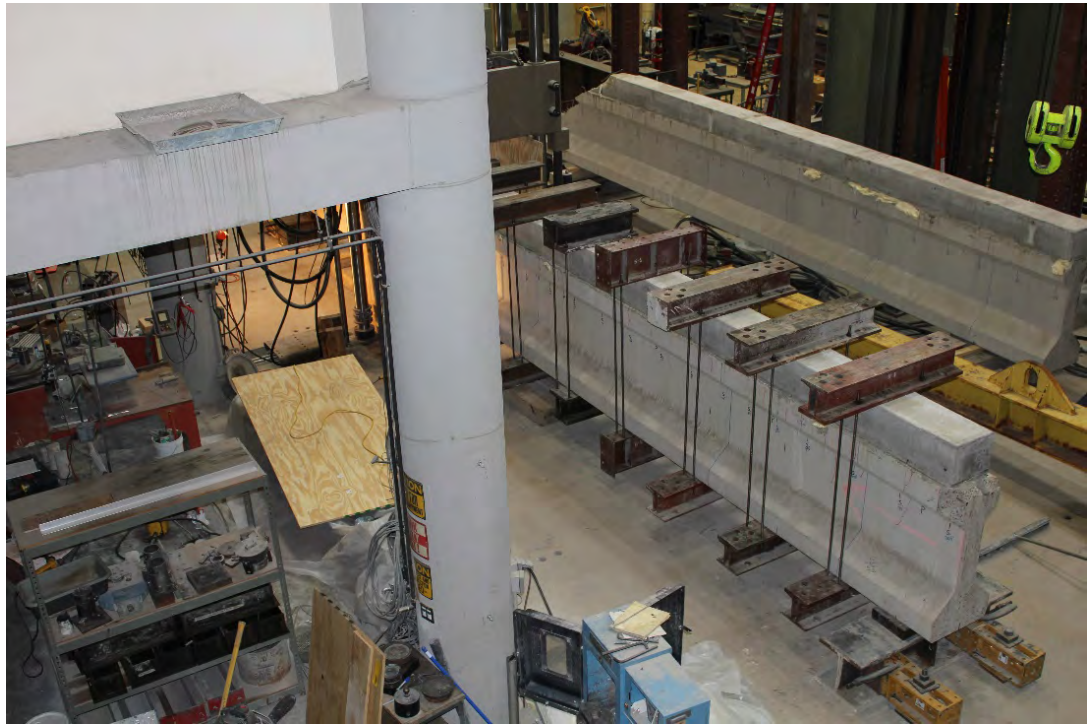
External shear reinforcement located between load point and cut end of girder
